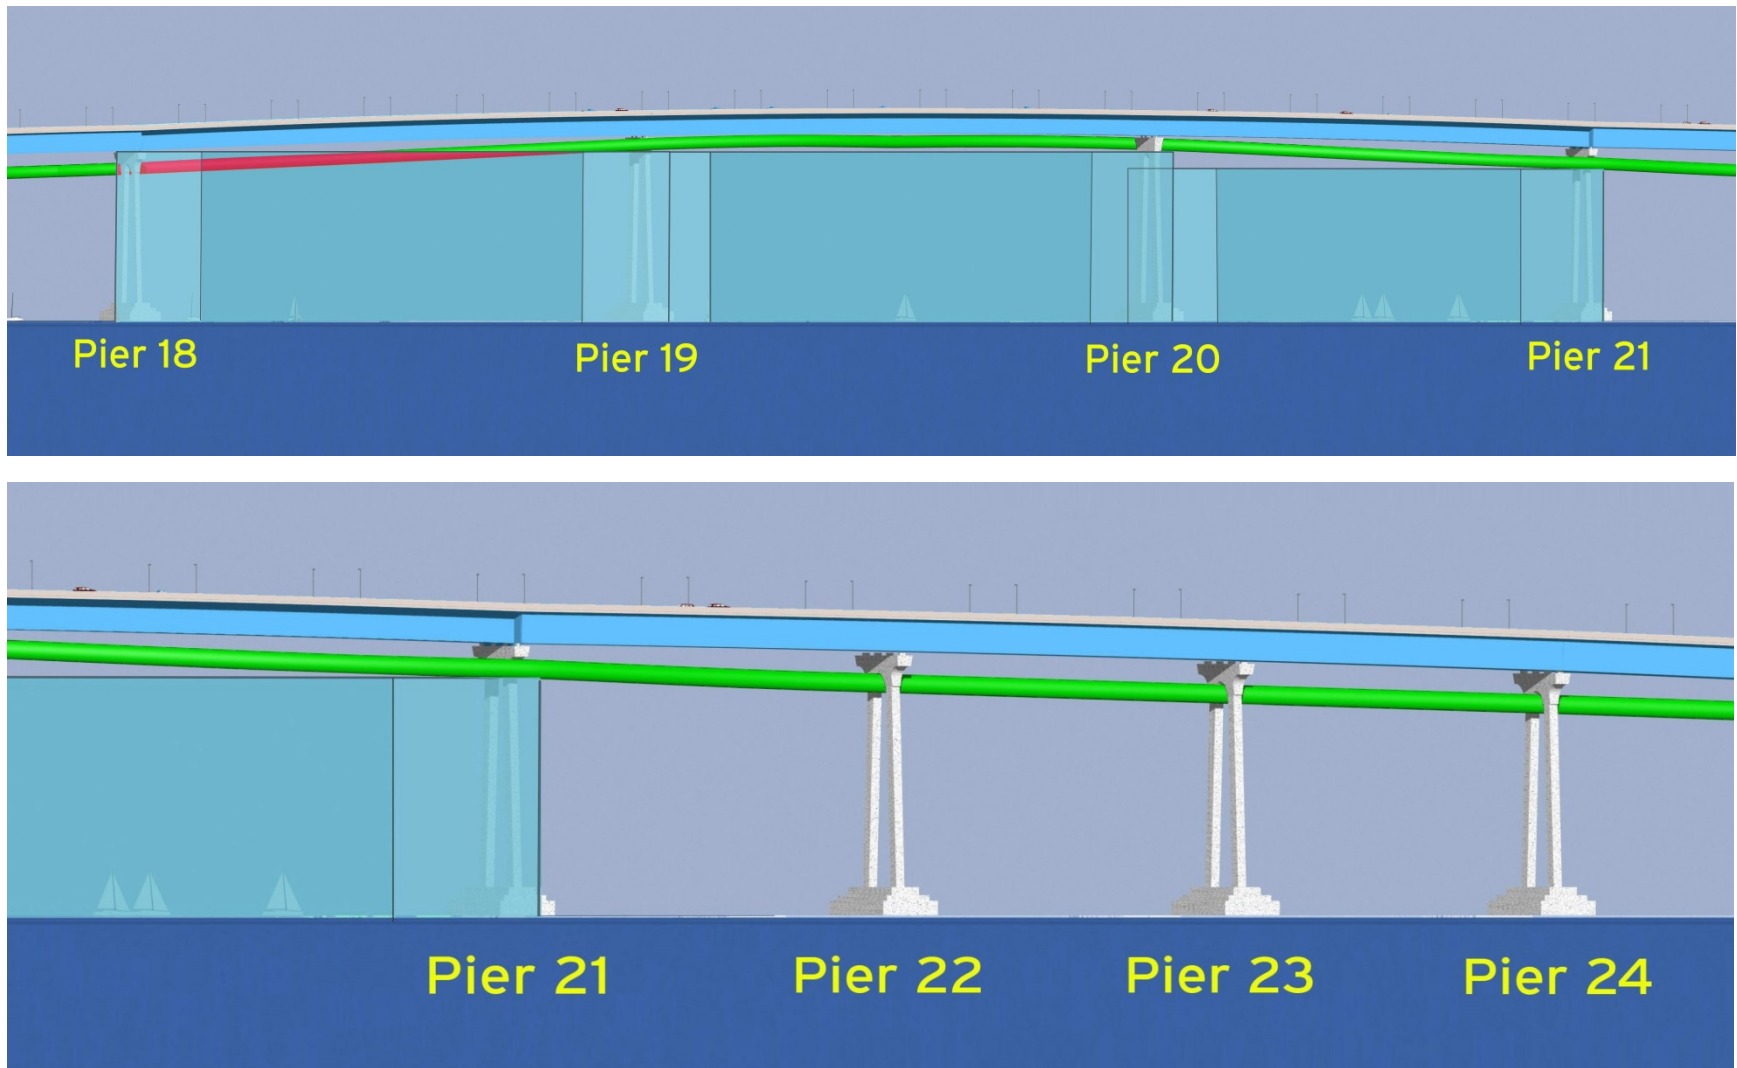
Side to Side Transitions at the Navigation Channels and Conflict Point at Pier 18 (shown in red)
